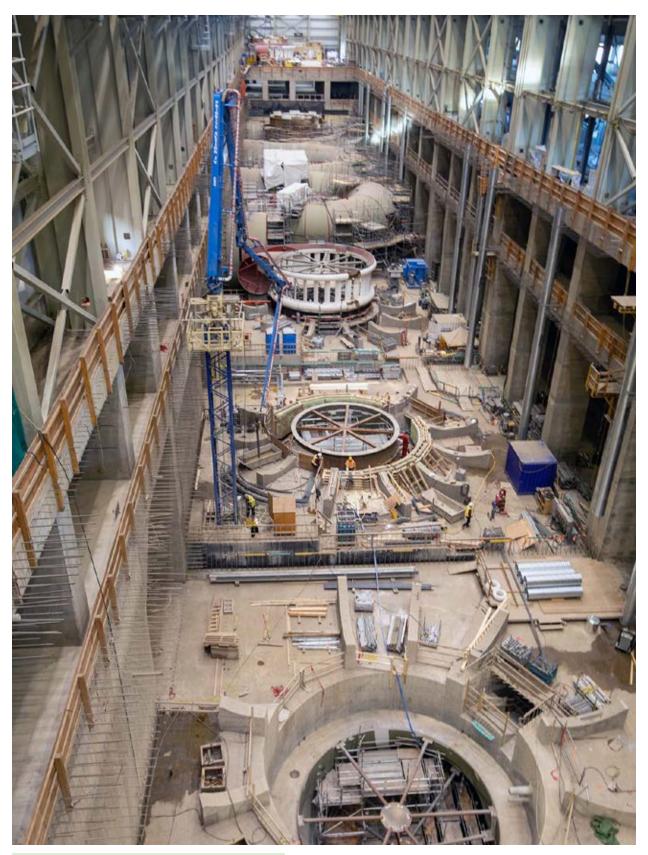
Site C – Powerhouse (Photo: BC Hydro)
